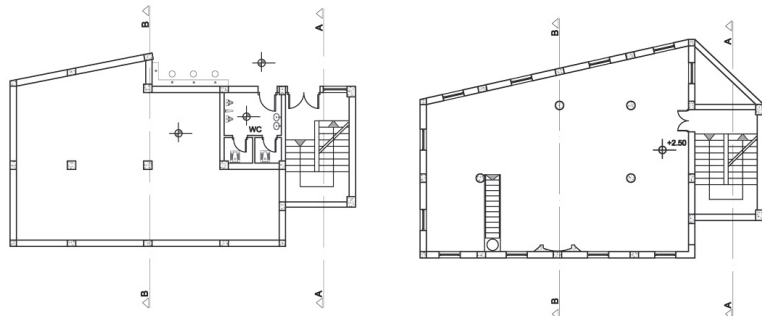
The Imam Azam Mosque’s ground floor plan in the permit and ground floor plan in practice.
